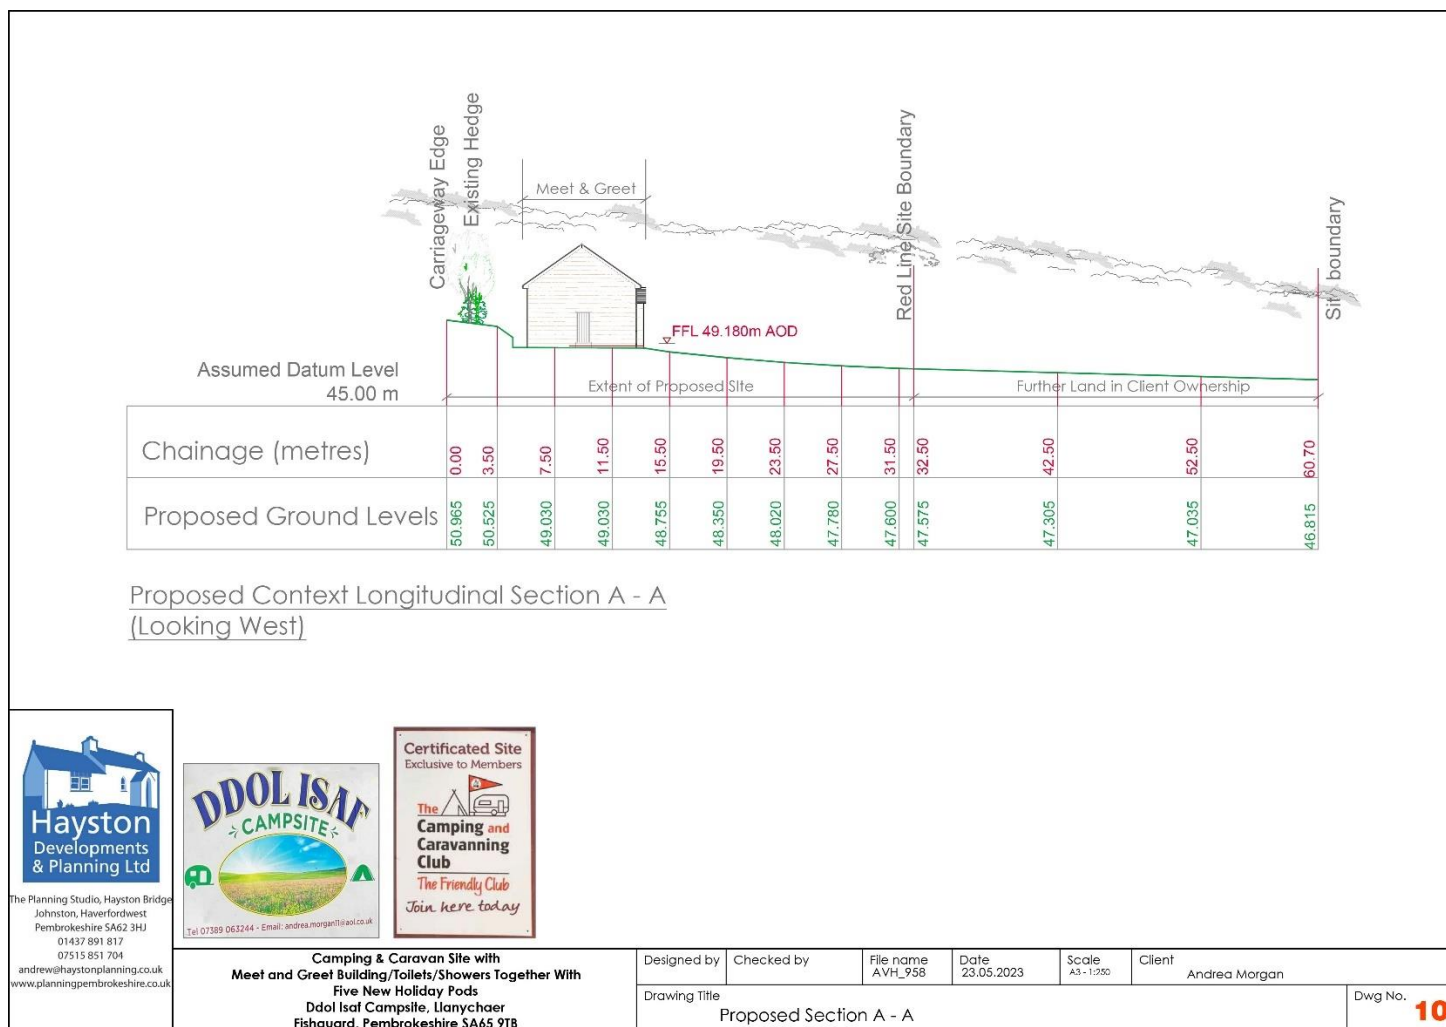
Proposed section through the site, showing the terracing for the meet and greet building. Plan provided by the client, not reproduced to scale.
